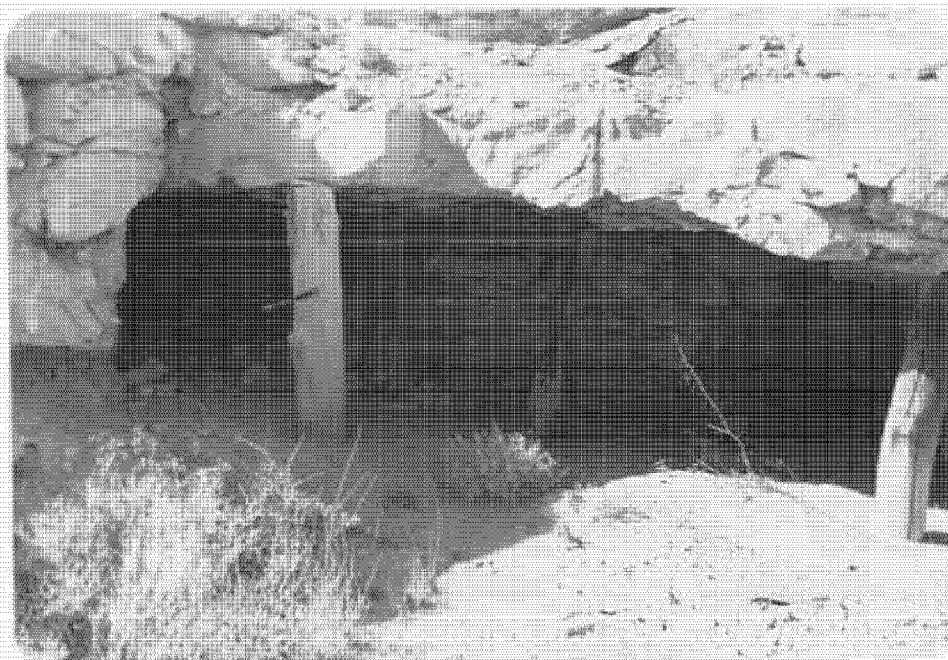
Photo E - Looking west. Close up of adit in Photo D showing timbering. Note hammer in left post for scale.
